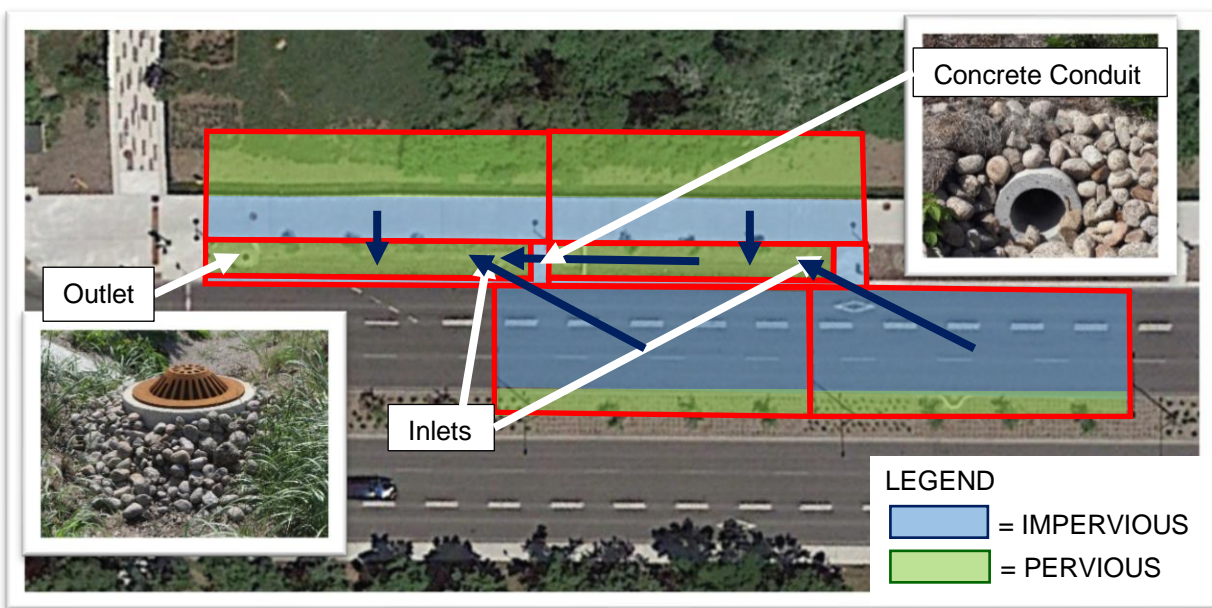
Plan view of a bioretention structure taken from Google Earth
